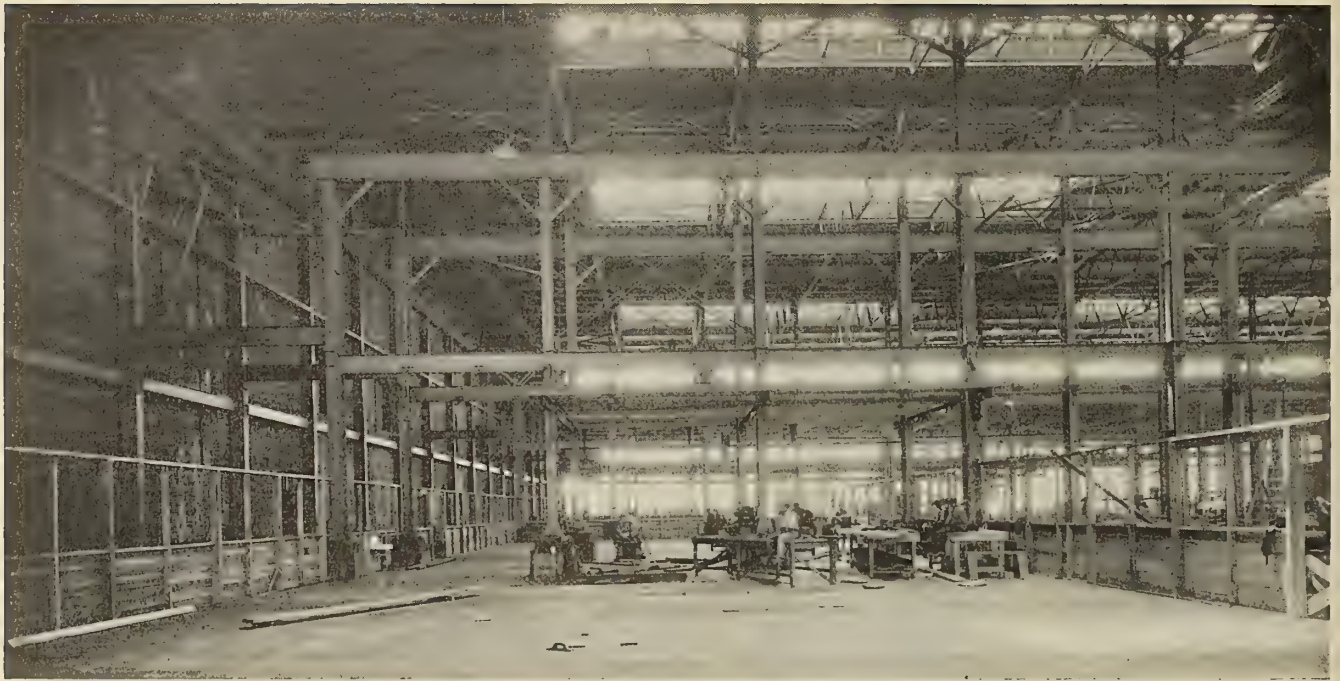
Interior of Shop Building, Showing Type of Construction
